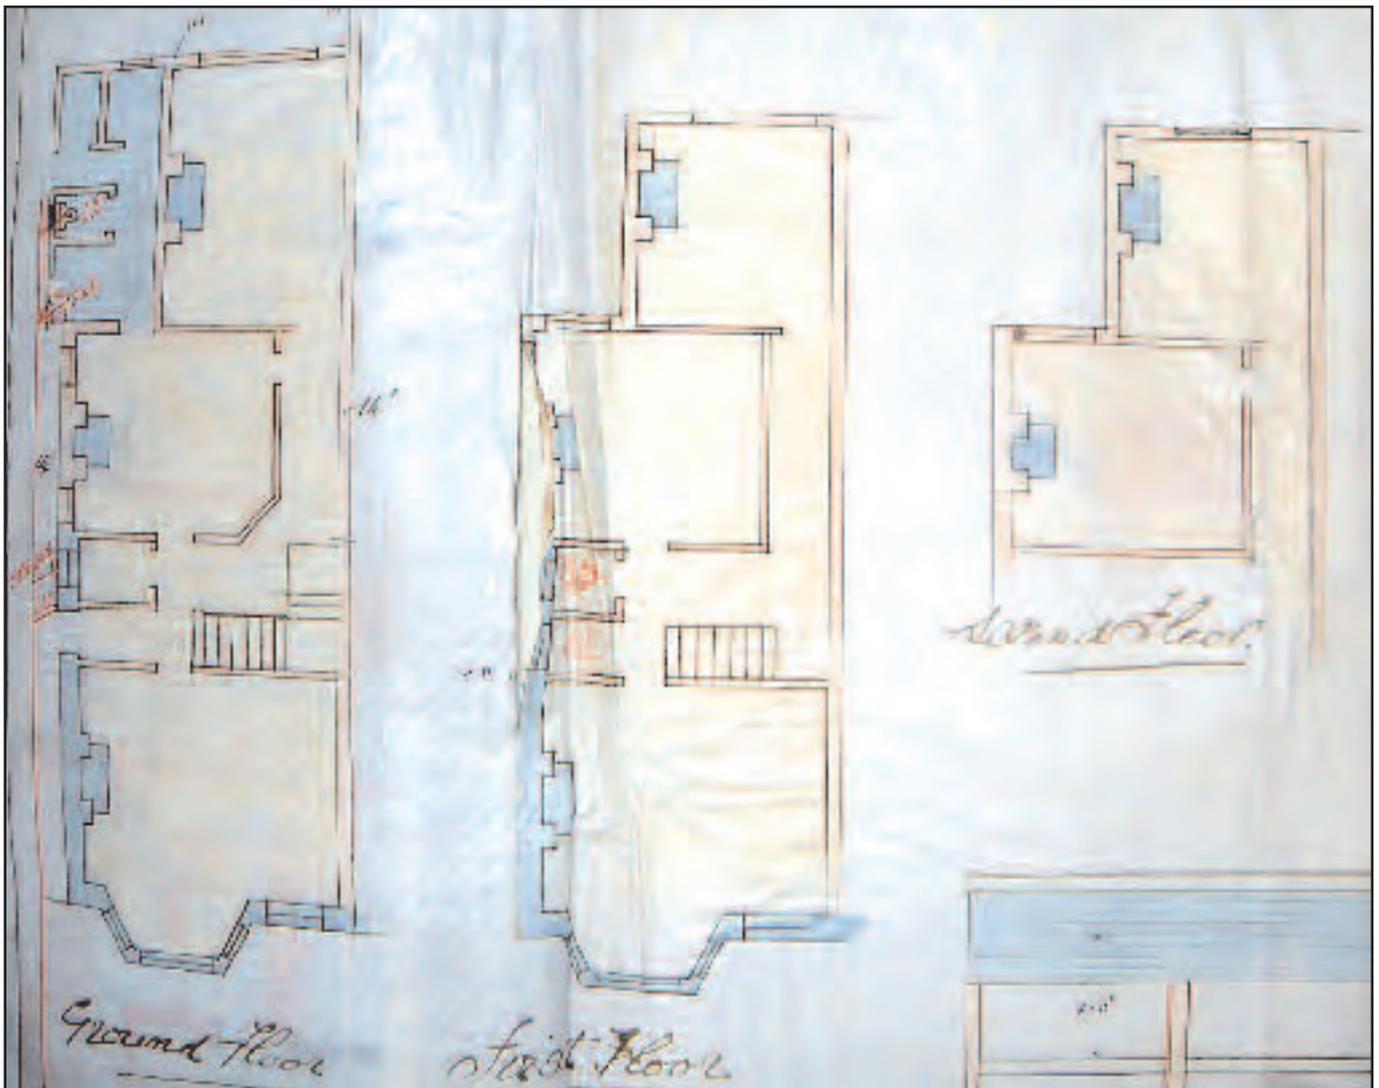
Floor plans, 4-24 Tyndall Avenue, 1905
